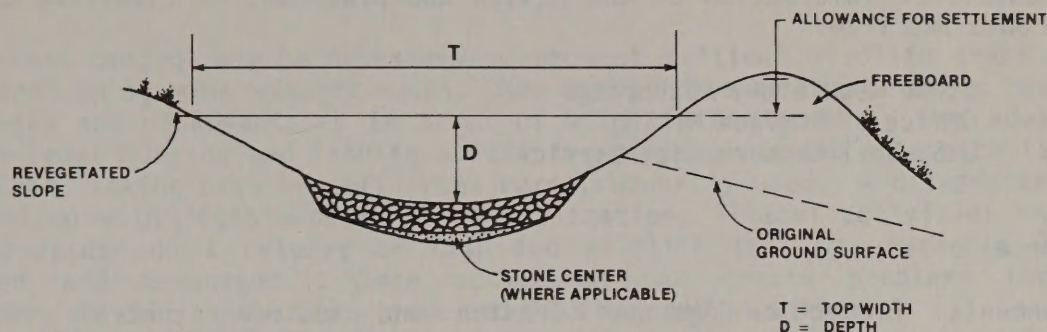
Stone center diversion for use in areas with heavy runoff.
